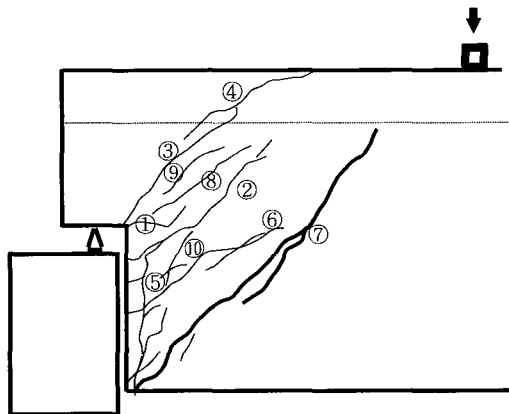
Example of shear cracking at failure stage (G-2-A)
